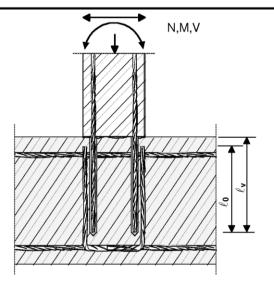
Overlap joint in a foundation of a column or wall where the rebars are stressed in tension
